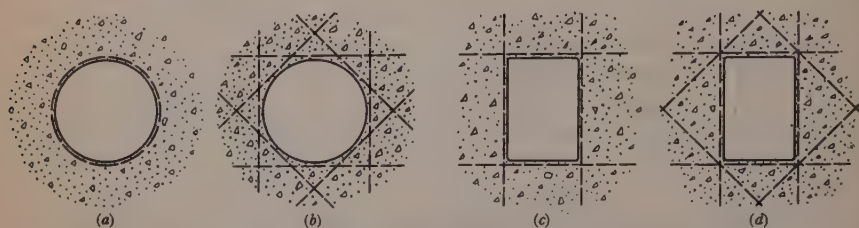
METHODS OF PLACING STEEL REINFORCEMENT AROUND HOLES IN MASS CONCRETE
